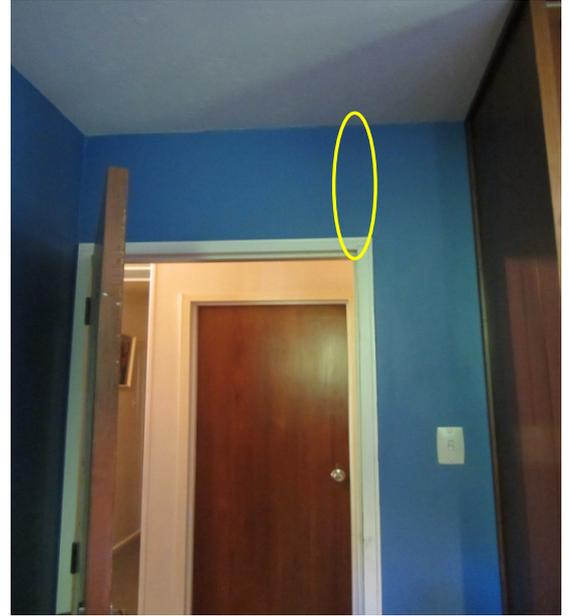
Hairline Cracking along Wall Lining Joint above Doorway in SW Bedroom
